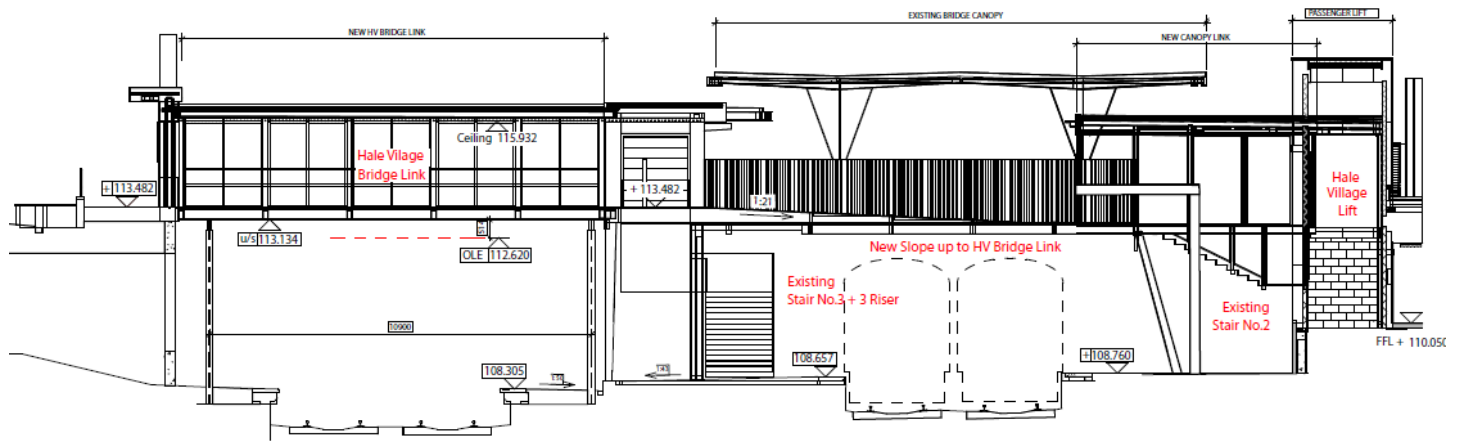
Cross-section drawing of the proposed link bridge between Hale Village and the existing station structure viewed from the north.
